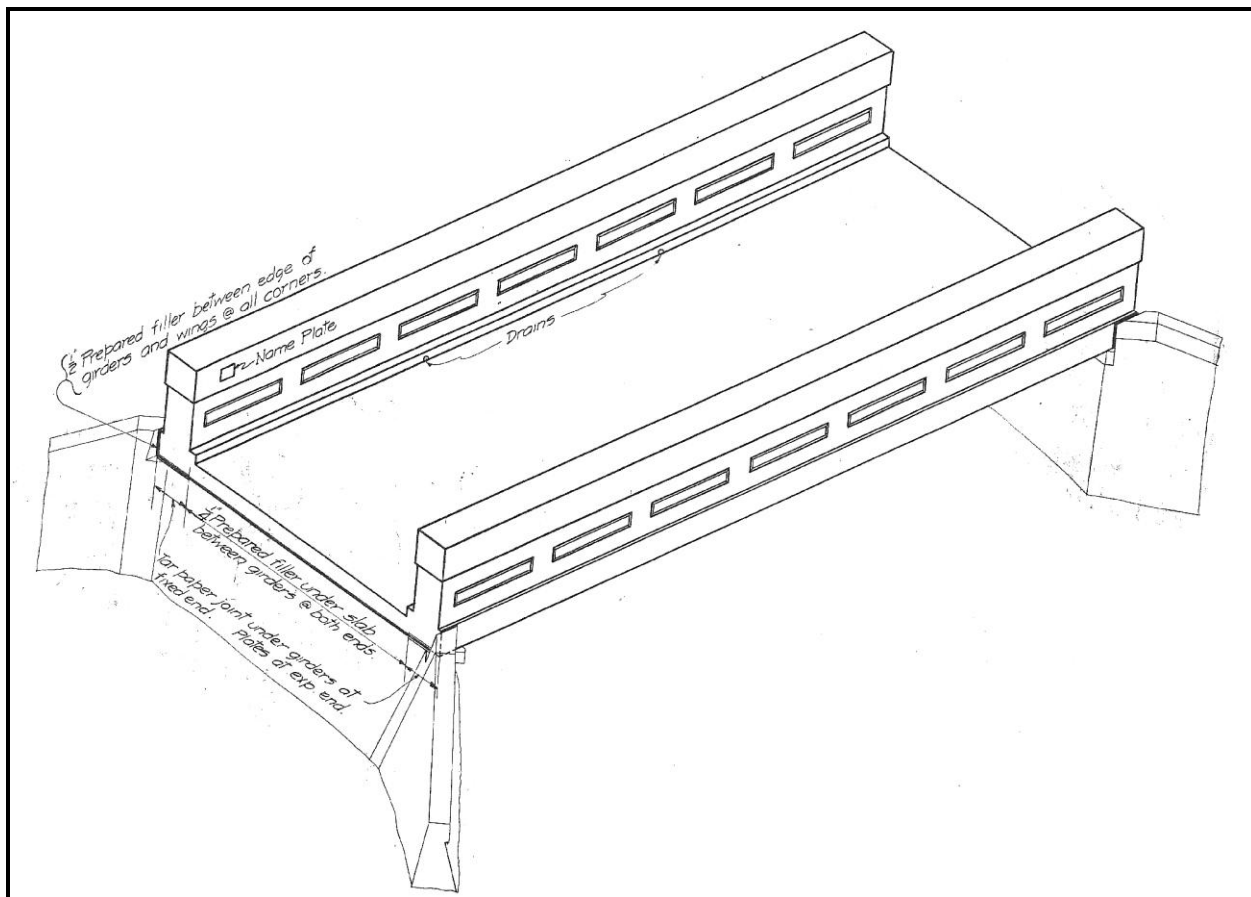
Isometric drawing of a concrete through girder bridge according to 1927 State Road Commission plans
